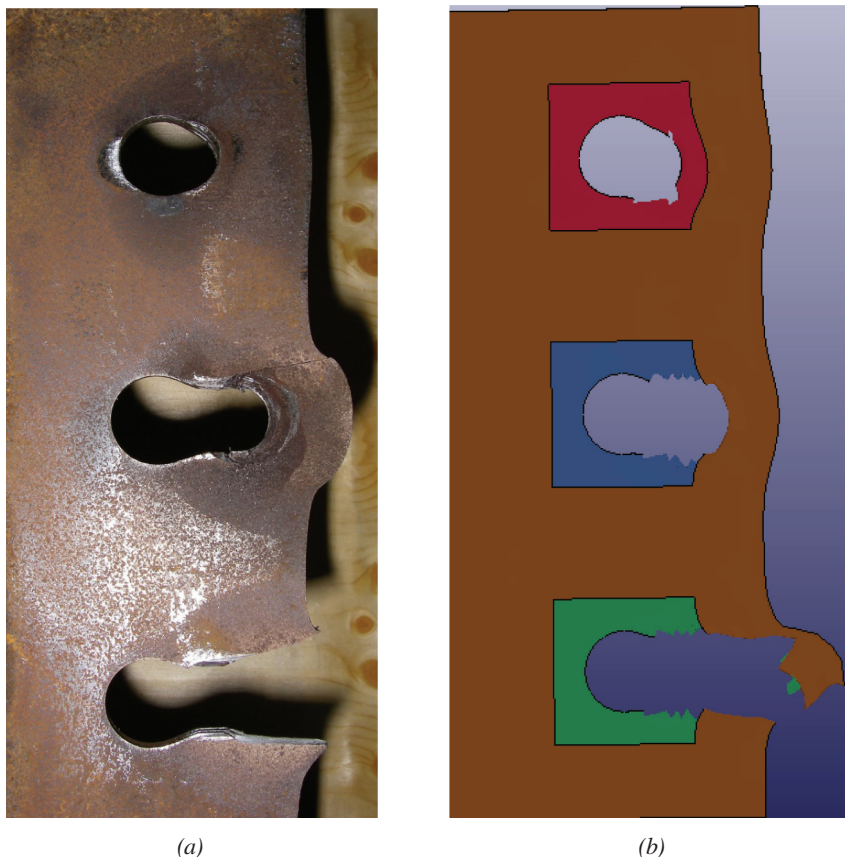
Failure of connection details due to high strain rates: (a) actual connection plate; (b) connection detail model (photographs courtesy of Professor Ian Burgess).
